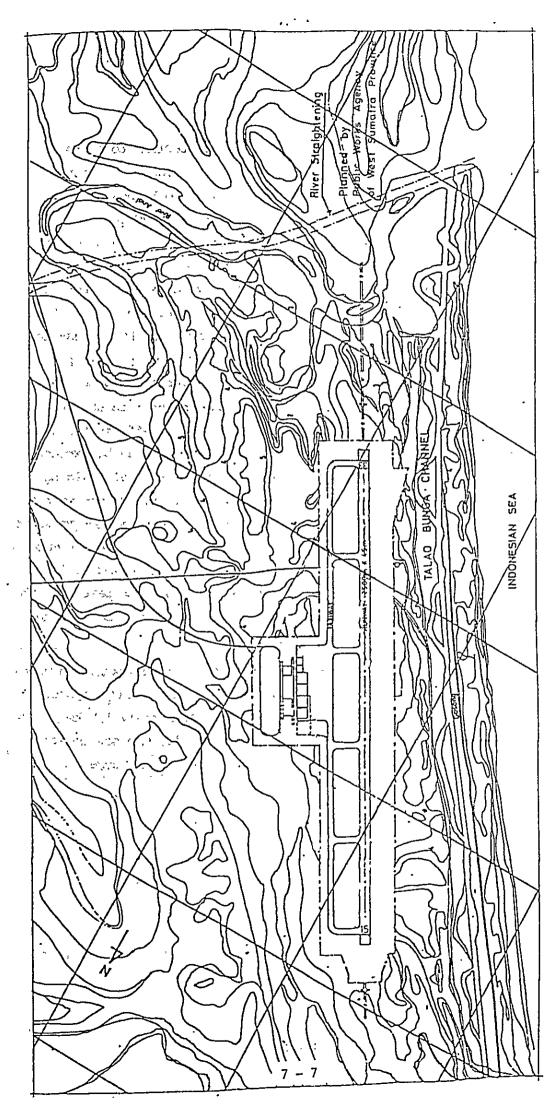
AIRPORT LAVOUT PLAN AT KETAPING
